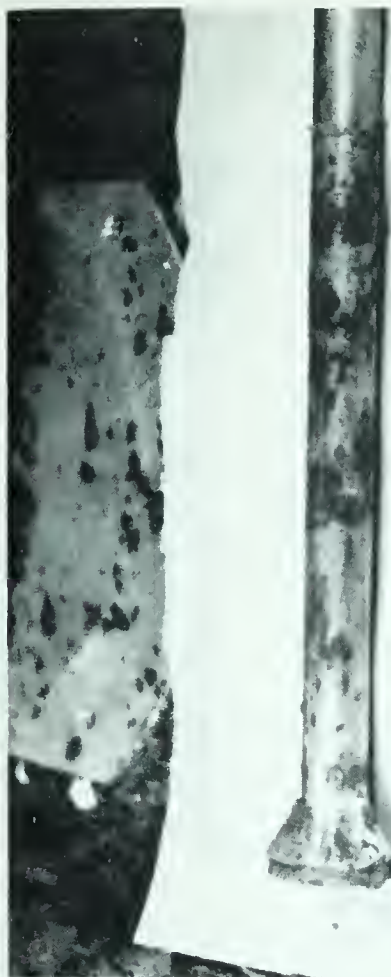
Soil adhering to pile surface, Test A-3.
